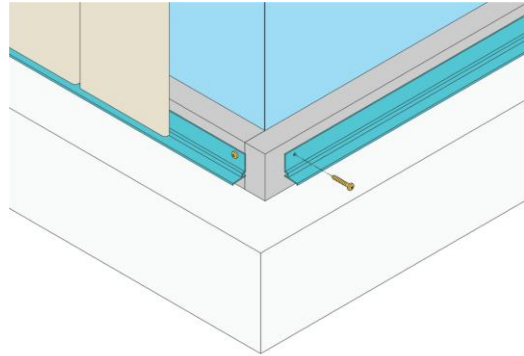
Vertical installation overview: horizontal top hat layout and direction of boarding
